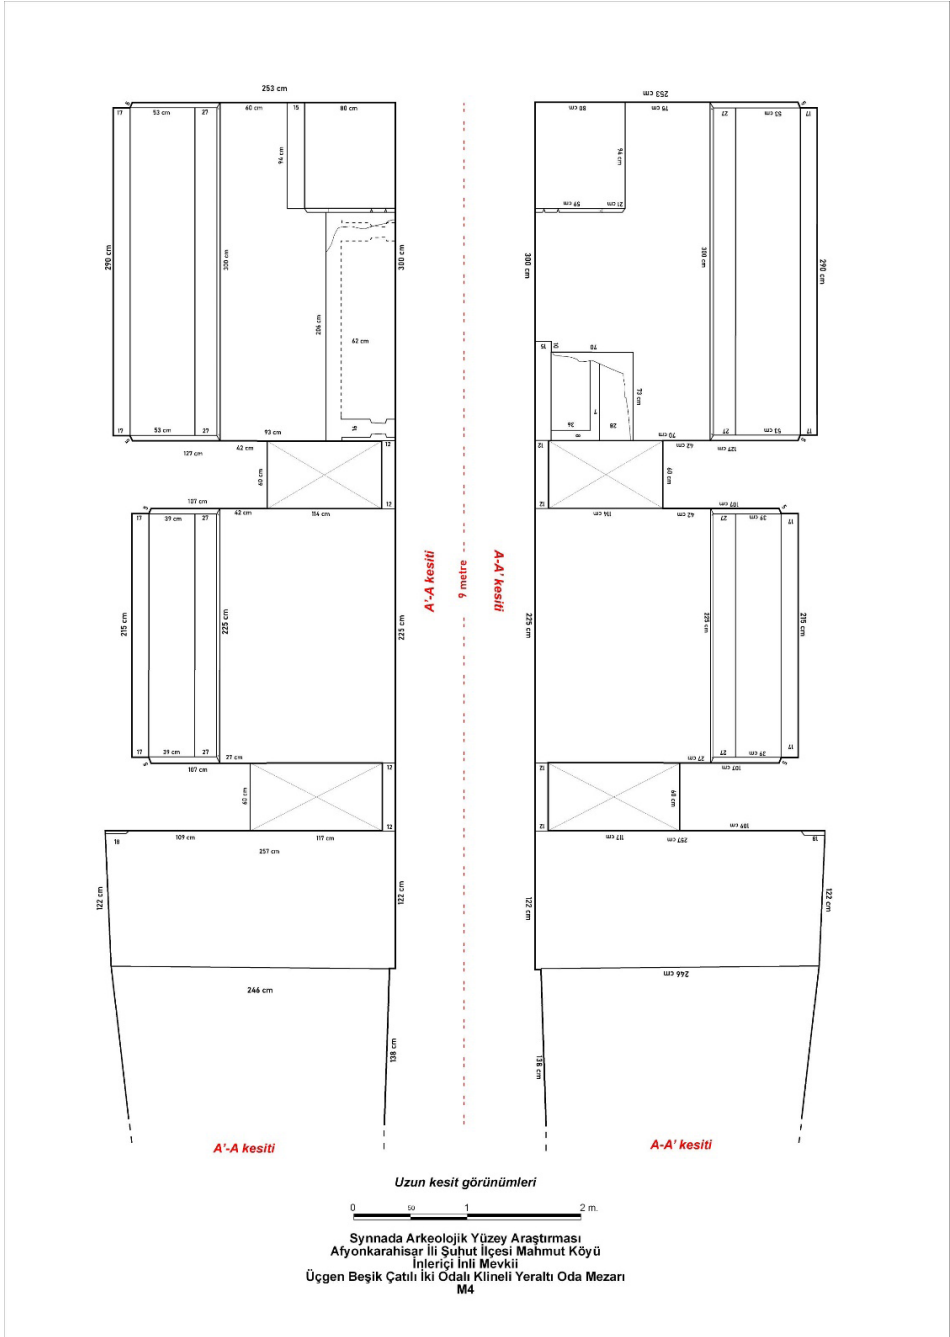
İnli M4 drawing, plan and cross-section view of rock-cut tomb (i.baytak)
